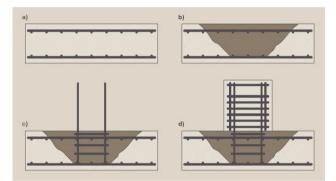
Schematic depiction of executing a rebar connection with partial demolition
